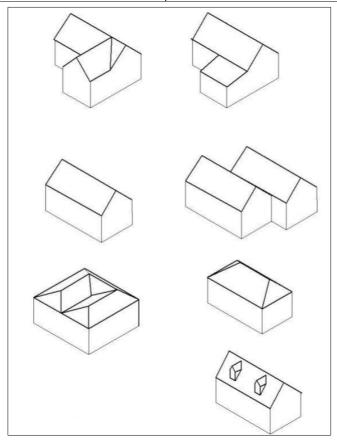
Roof forms as required by clause NOR-S6.7.2 A1
